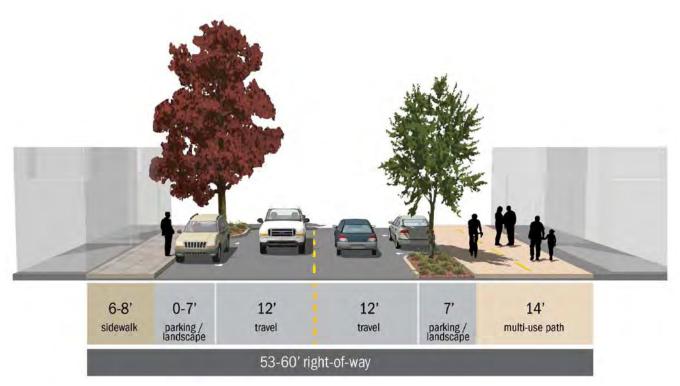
Conceptual Cross-Section for Main Street North of Beta Street (looking north)
